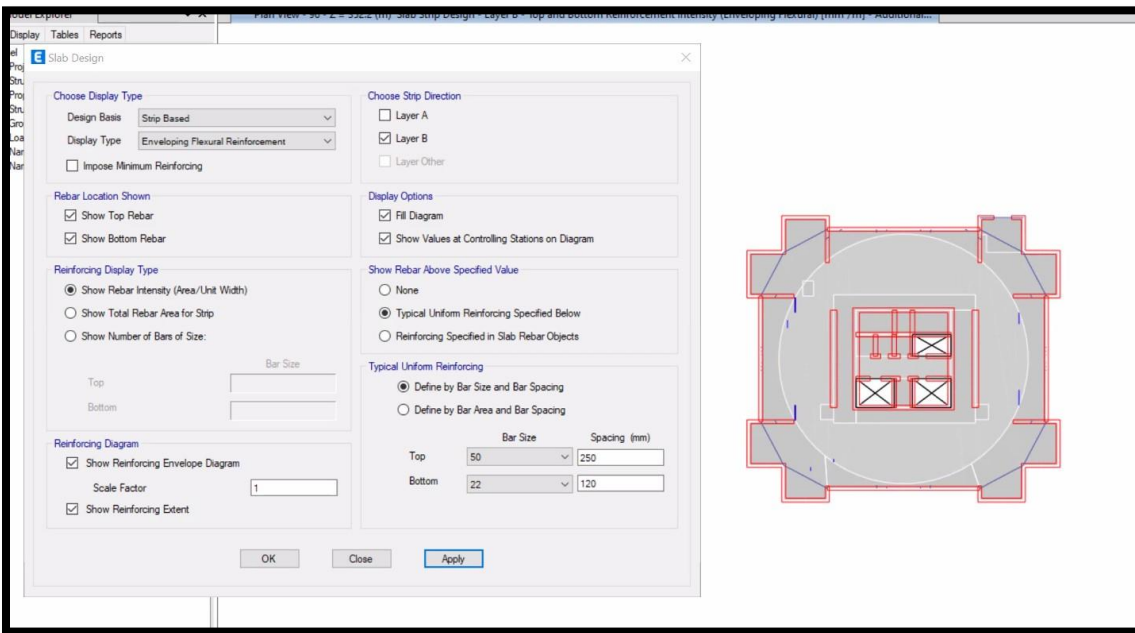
Bottom Reinforcement in Y-Direction for Drop Panels Regions in 96th Floor
